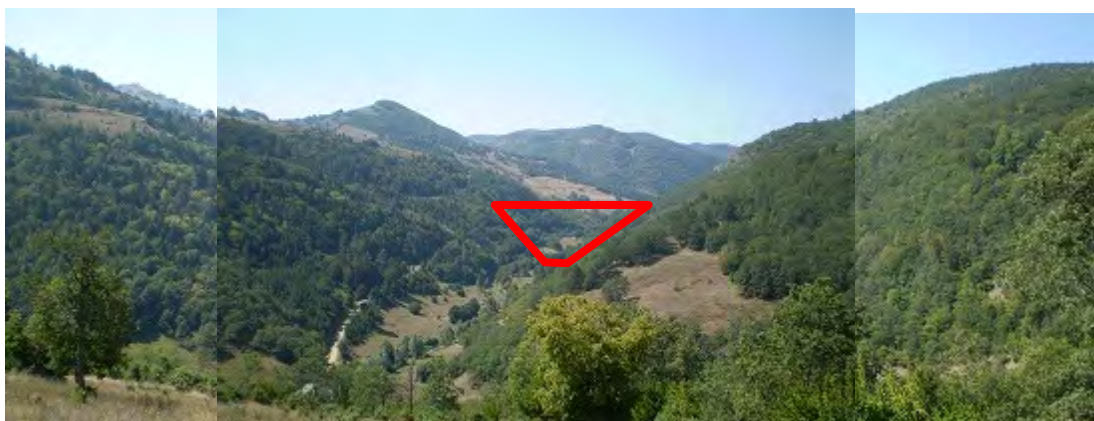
Upper Dam / Reservoir Site (viewing from downstream)
